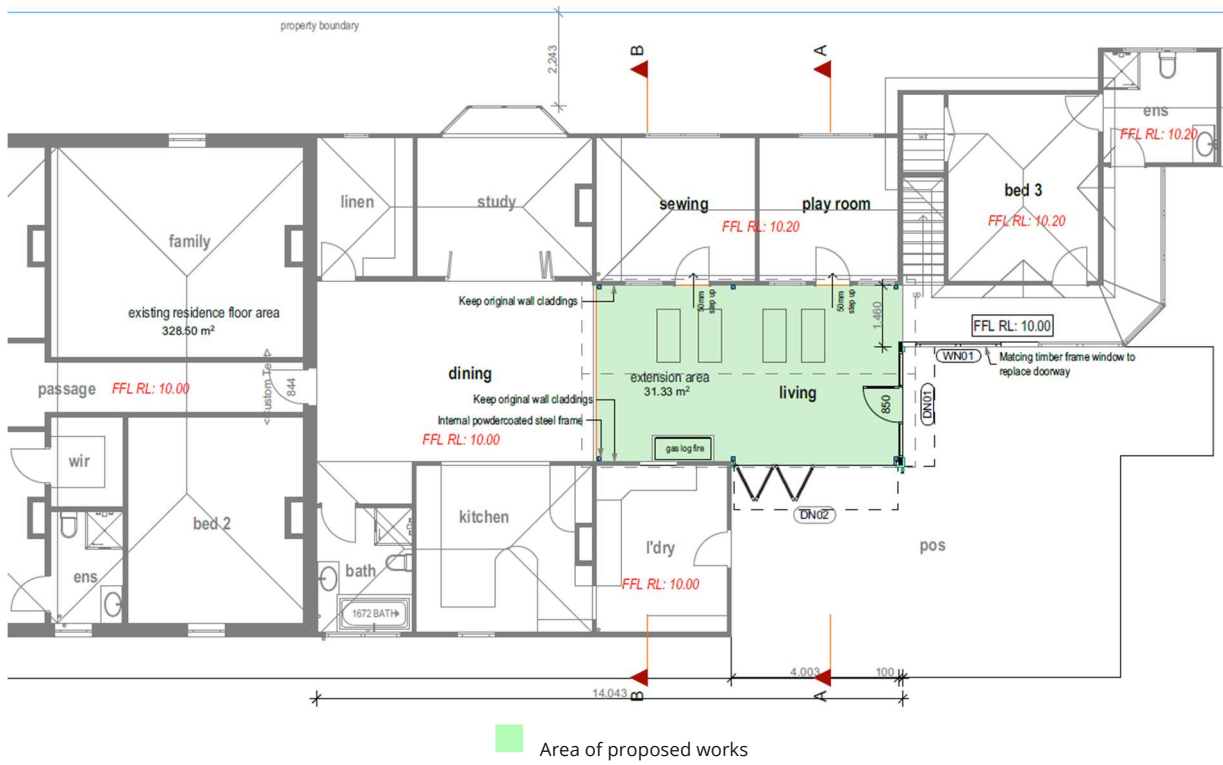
proposed floor plan (plan by J3 Design, 2024)
